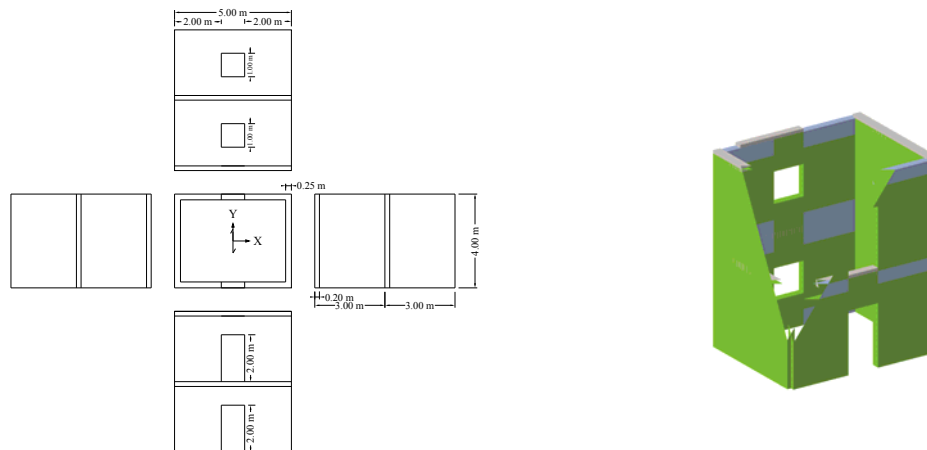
Building A: plan and views (left), and 3D mesh generated by 3Muri (right)
